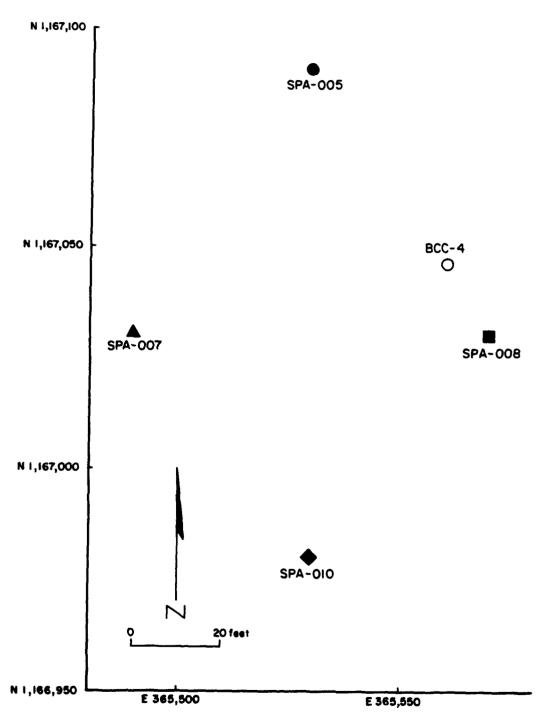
Plan View of Sector A Test Site at Jackson Lake Dam
